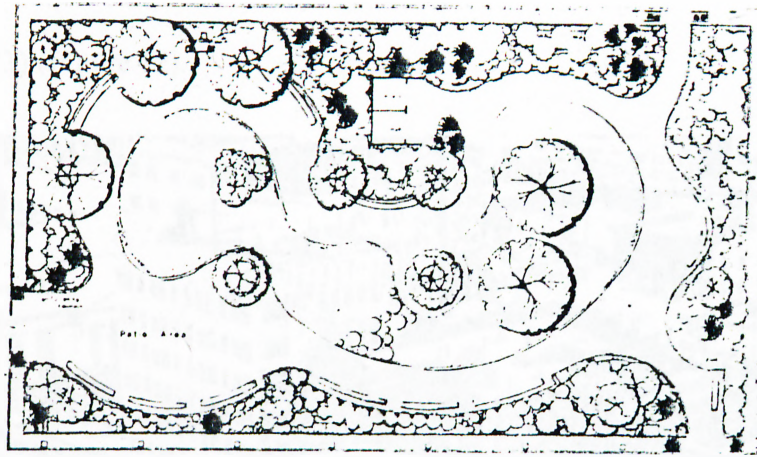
Plan of the roof garden at Kingston Hospital (Scrivens, 1982d, p. 89)
